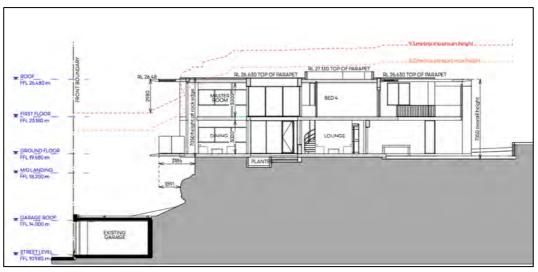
Figure C: Section plan of dwelling house showing proposed extent of variation to 9.5m HOB development standard under RLEP 2014
